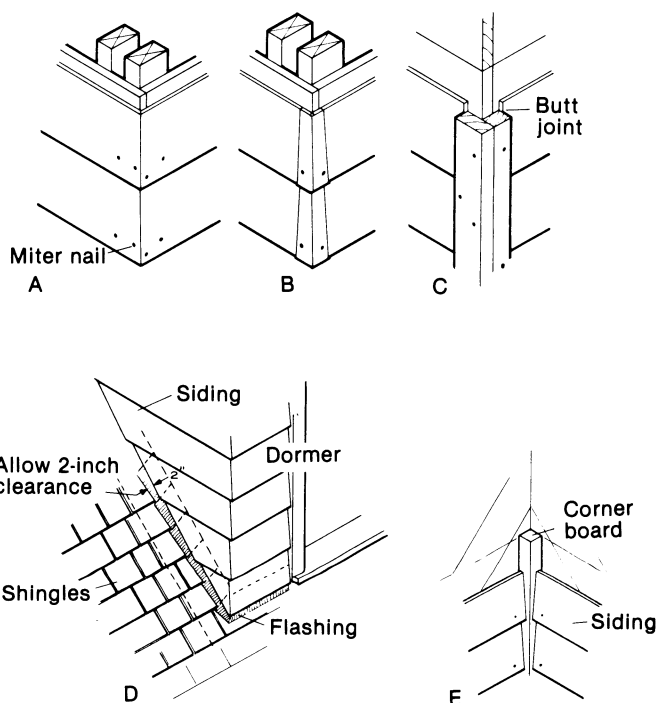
Recommended procedures for corners of siding: (A) miter corners, (B) metal corners, (C) corner boards, (D) siding return at roof, and (E) interior corner.
